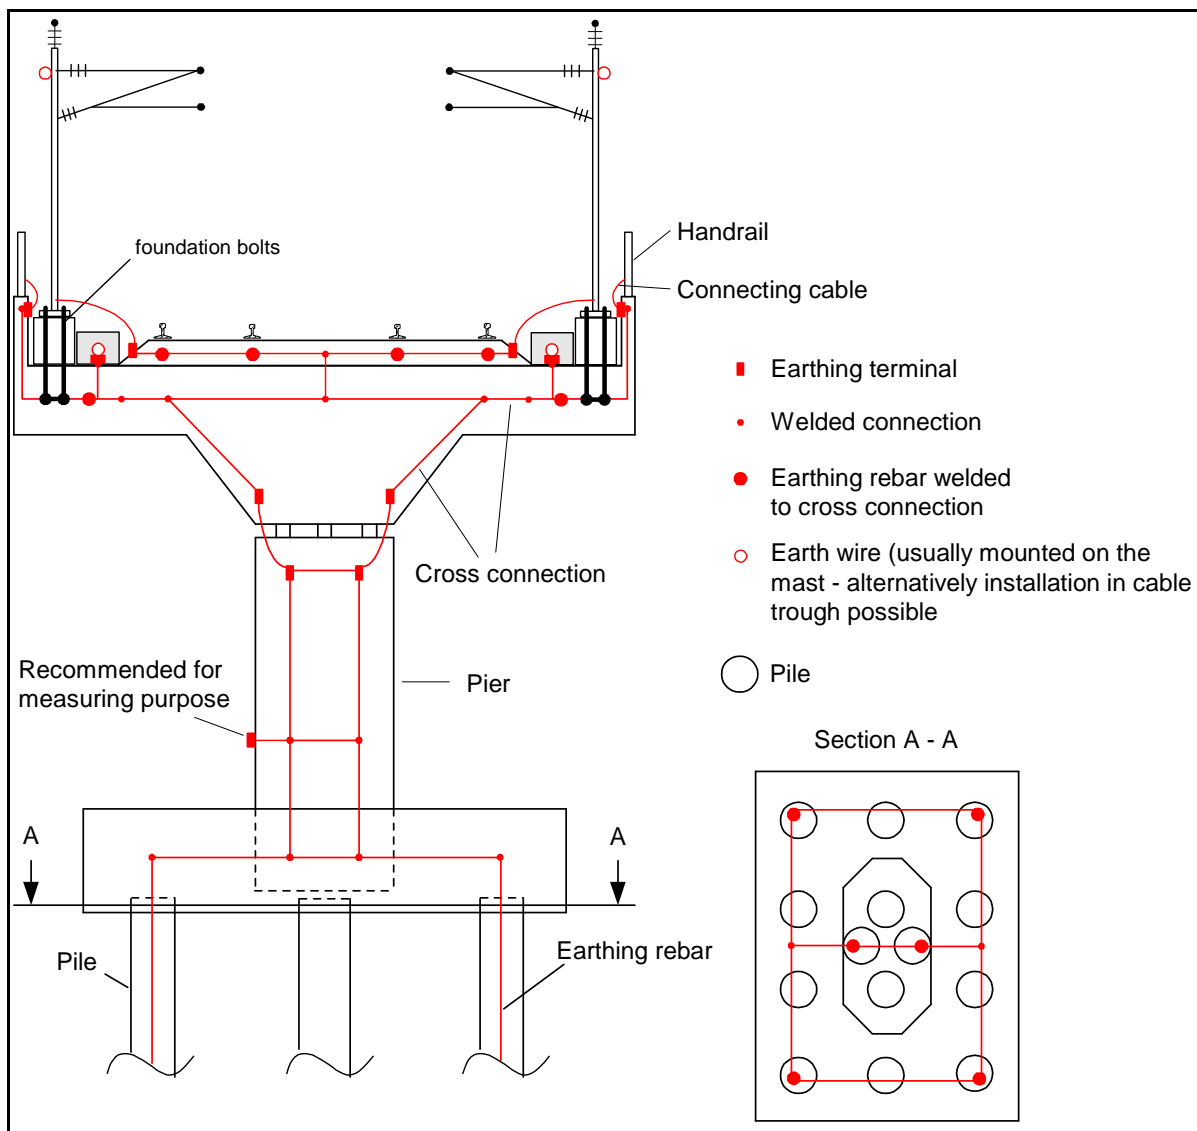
Example of Earthing Connections for Steel Reinforced Concrete Viaduct
